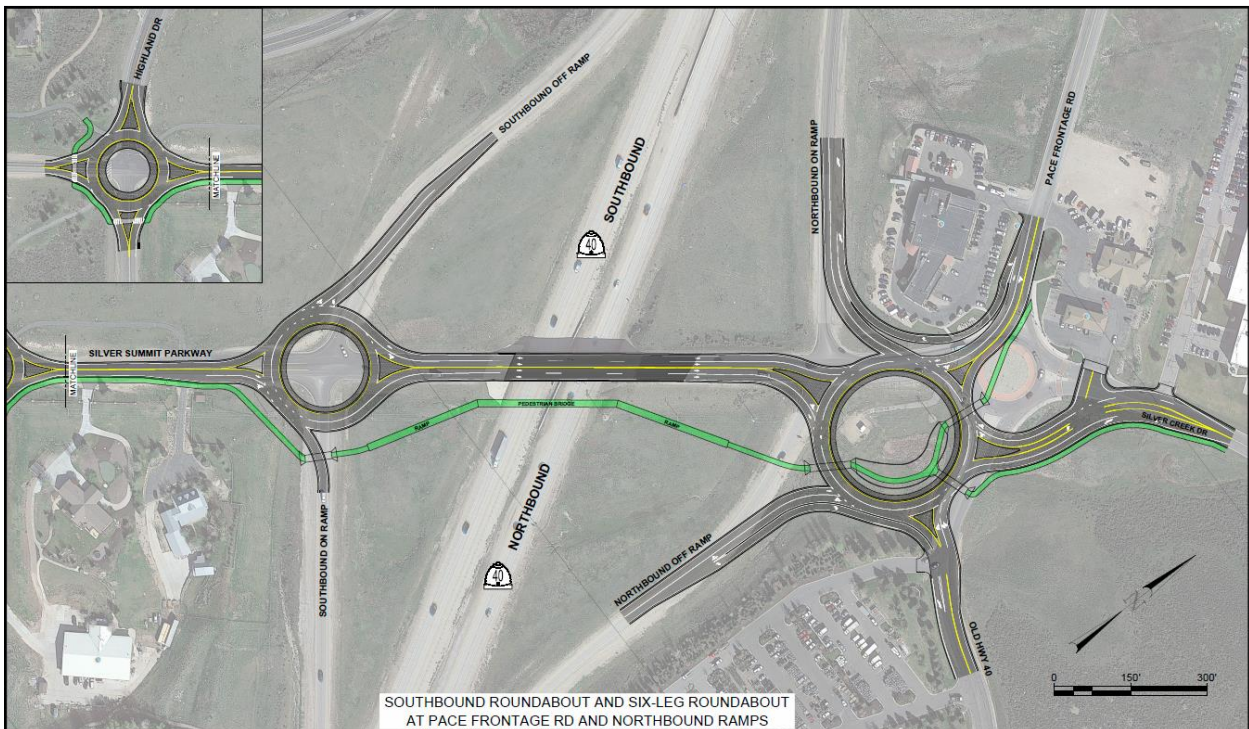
Southbound Roundabout and 6-Leg Roundabout at Pace Frontage Road and Northbound Ramps
